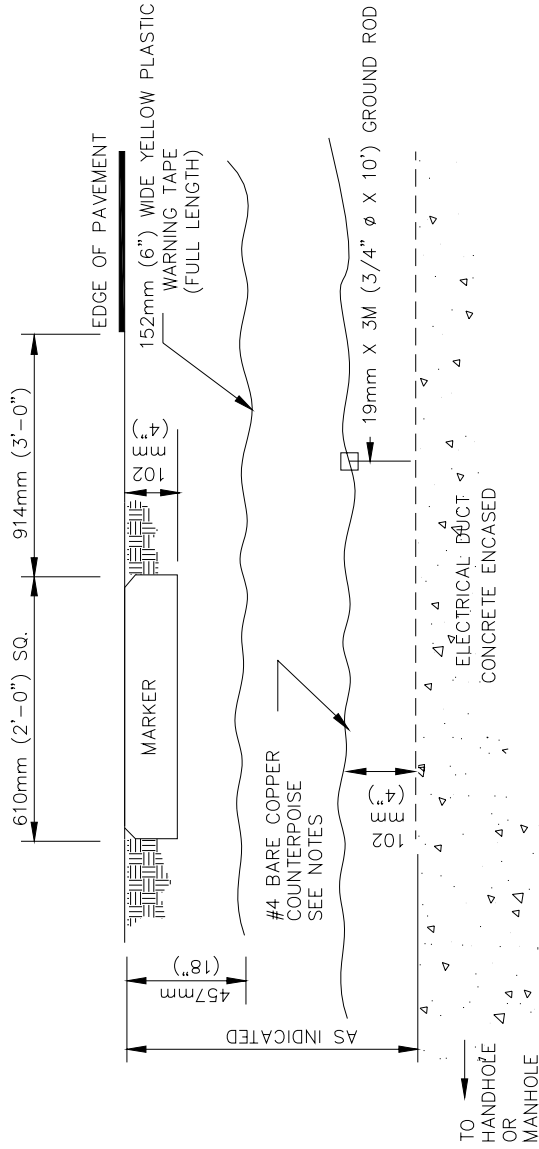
N. Counterpoise & Ground Rod Installation Detail (Navy Only)
